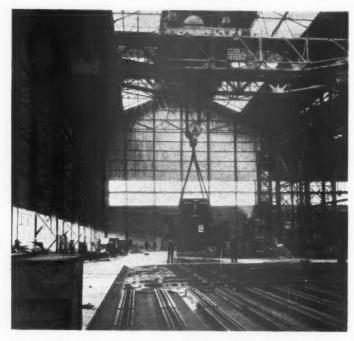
The test load on a 125 ton crane during the final building of the Groups' latest erection bay, No. 6 Bay at Darnall Works.
